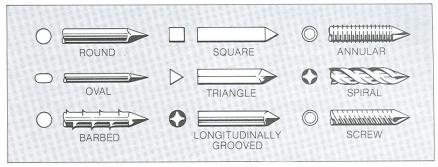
The first two shanks (round and oval) shown here are considered smooth shanks. The other types of shanks give greater holding power than smooth shanks.
